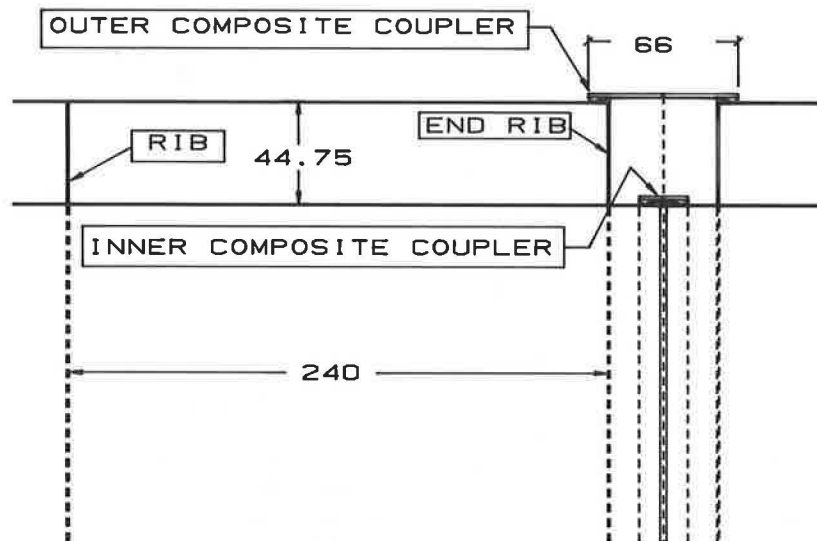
Detail of coupler and rib structure of a composite submersible tunnel structure.
